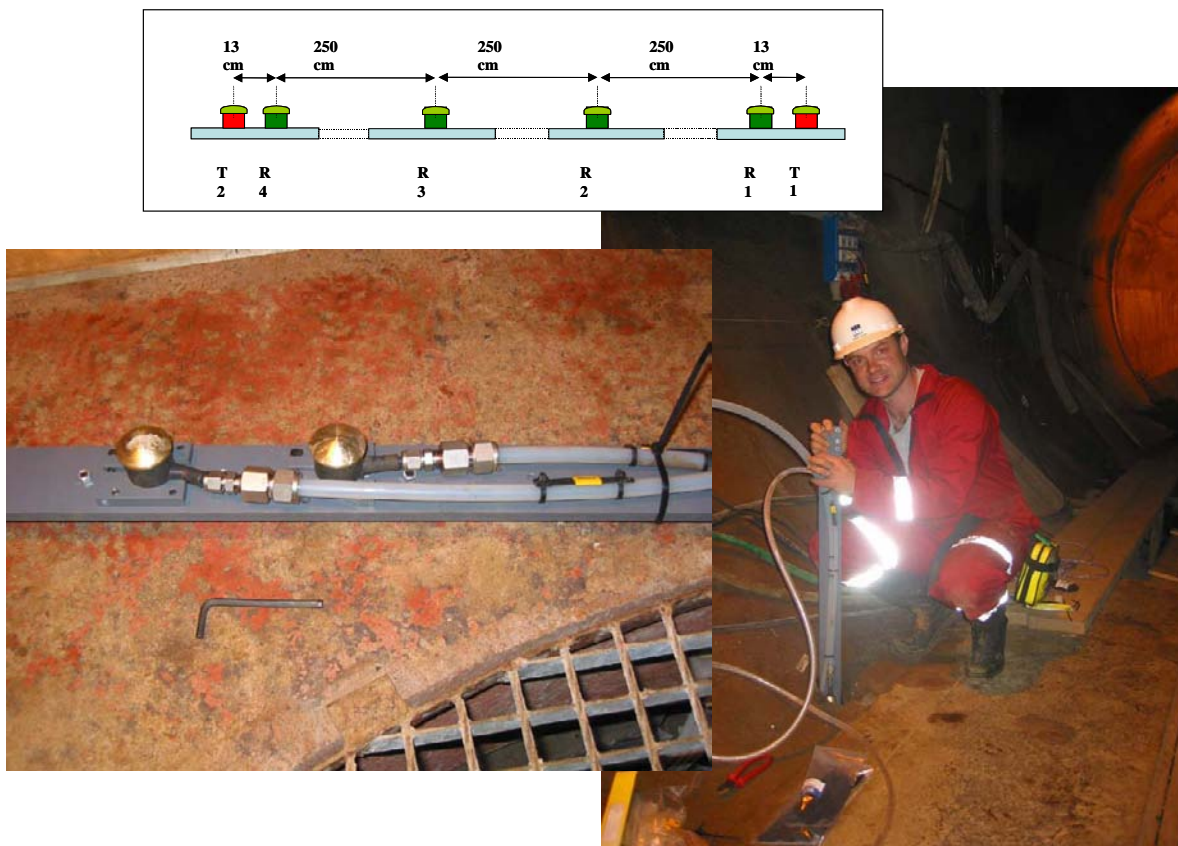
Top: Schematic diagram of the locations of all transducers on a single frame. Left: Photo of a section of the transducer assembly. Right: The transducer assembly during installation.
